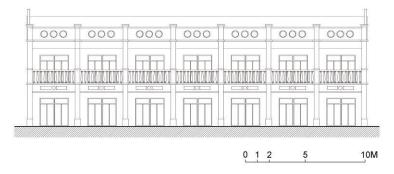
Elevation of No. 1 Arcade Building (Speculated) in the 1930s (Source: Drawn by the Author)
